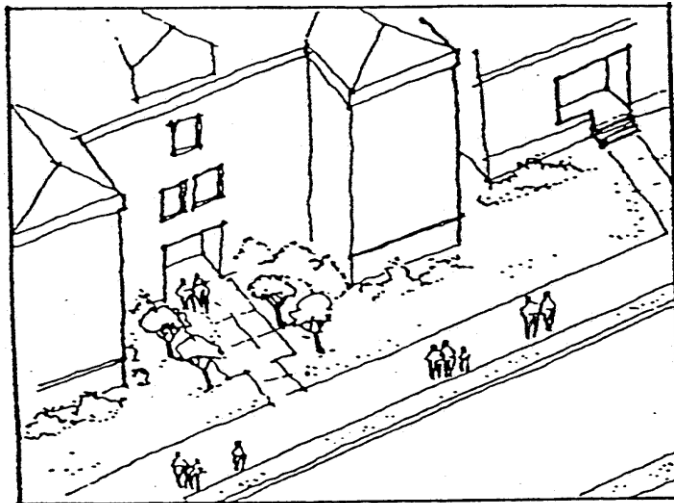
THIS BUILDING IS LOCATED FACING THE STREET WITH A PROMINENT ENTRANCE AND PEDESTRIAN PATH TO THE SIDEWALK.
